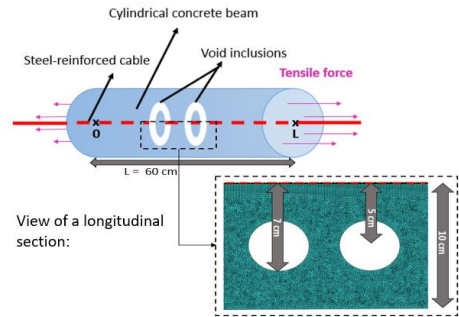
Cylindrical concrete beam with two inclusions and steel-reinforced cable in the center.
